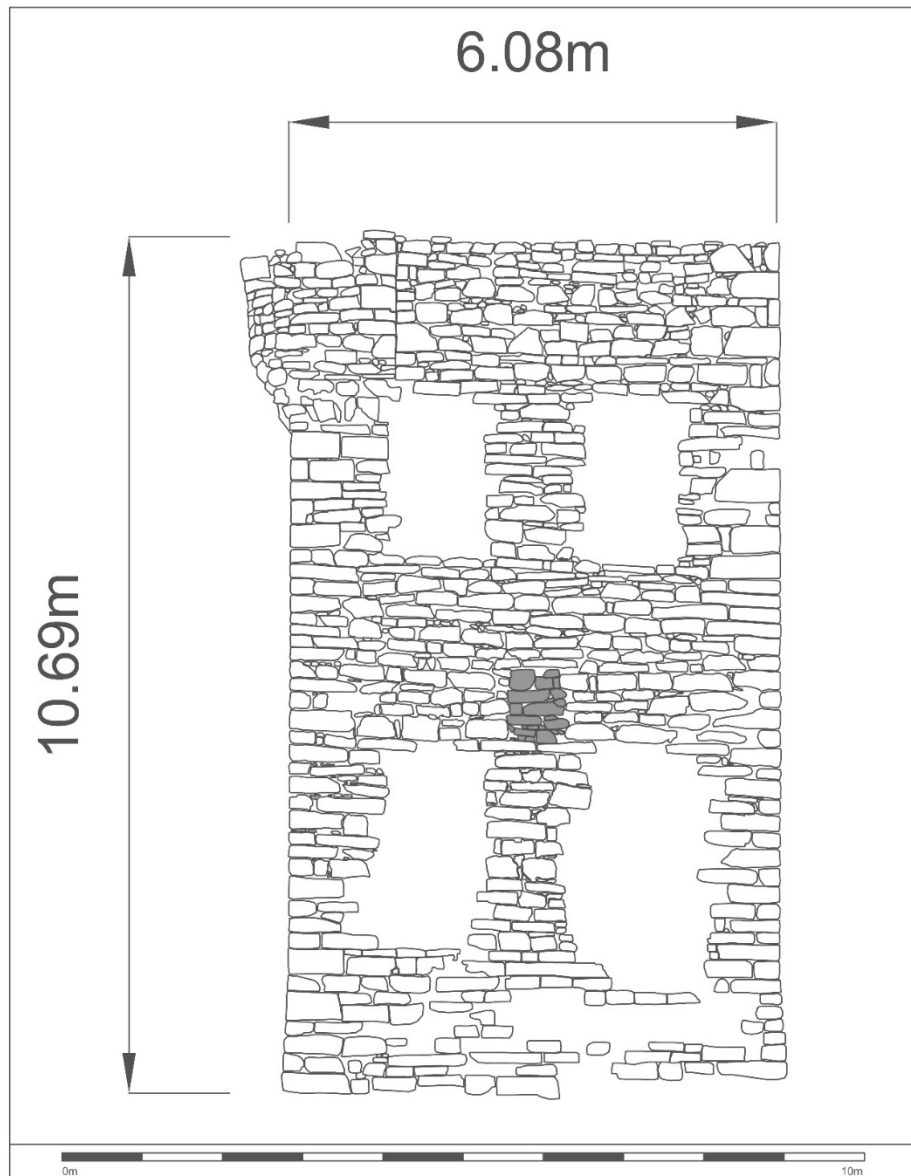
External elevation of the north wall of the signal tower at Glash Signal Station.
